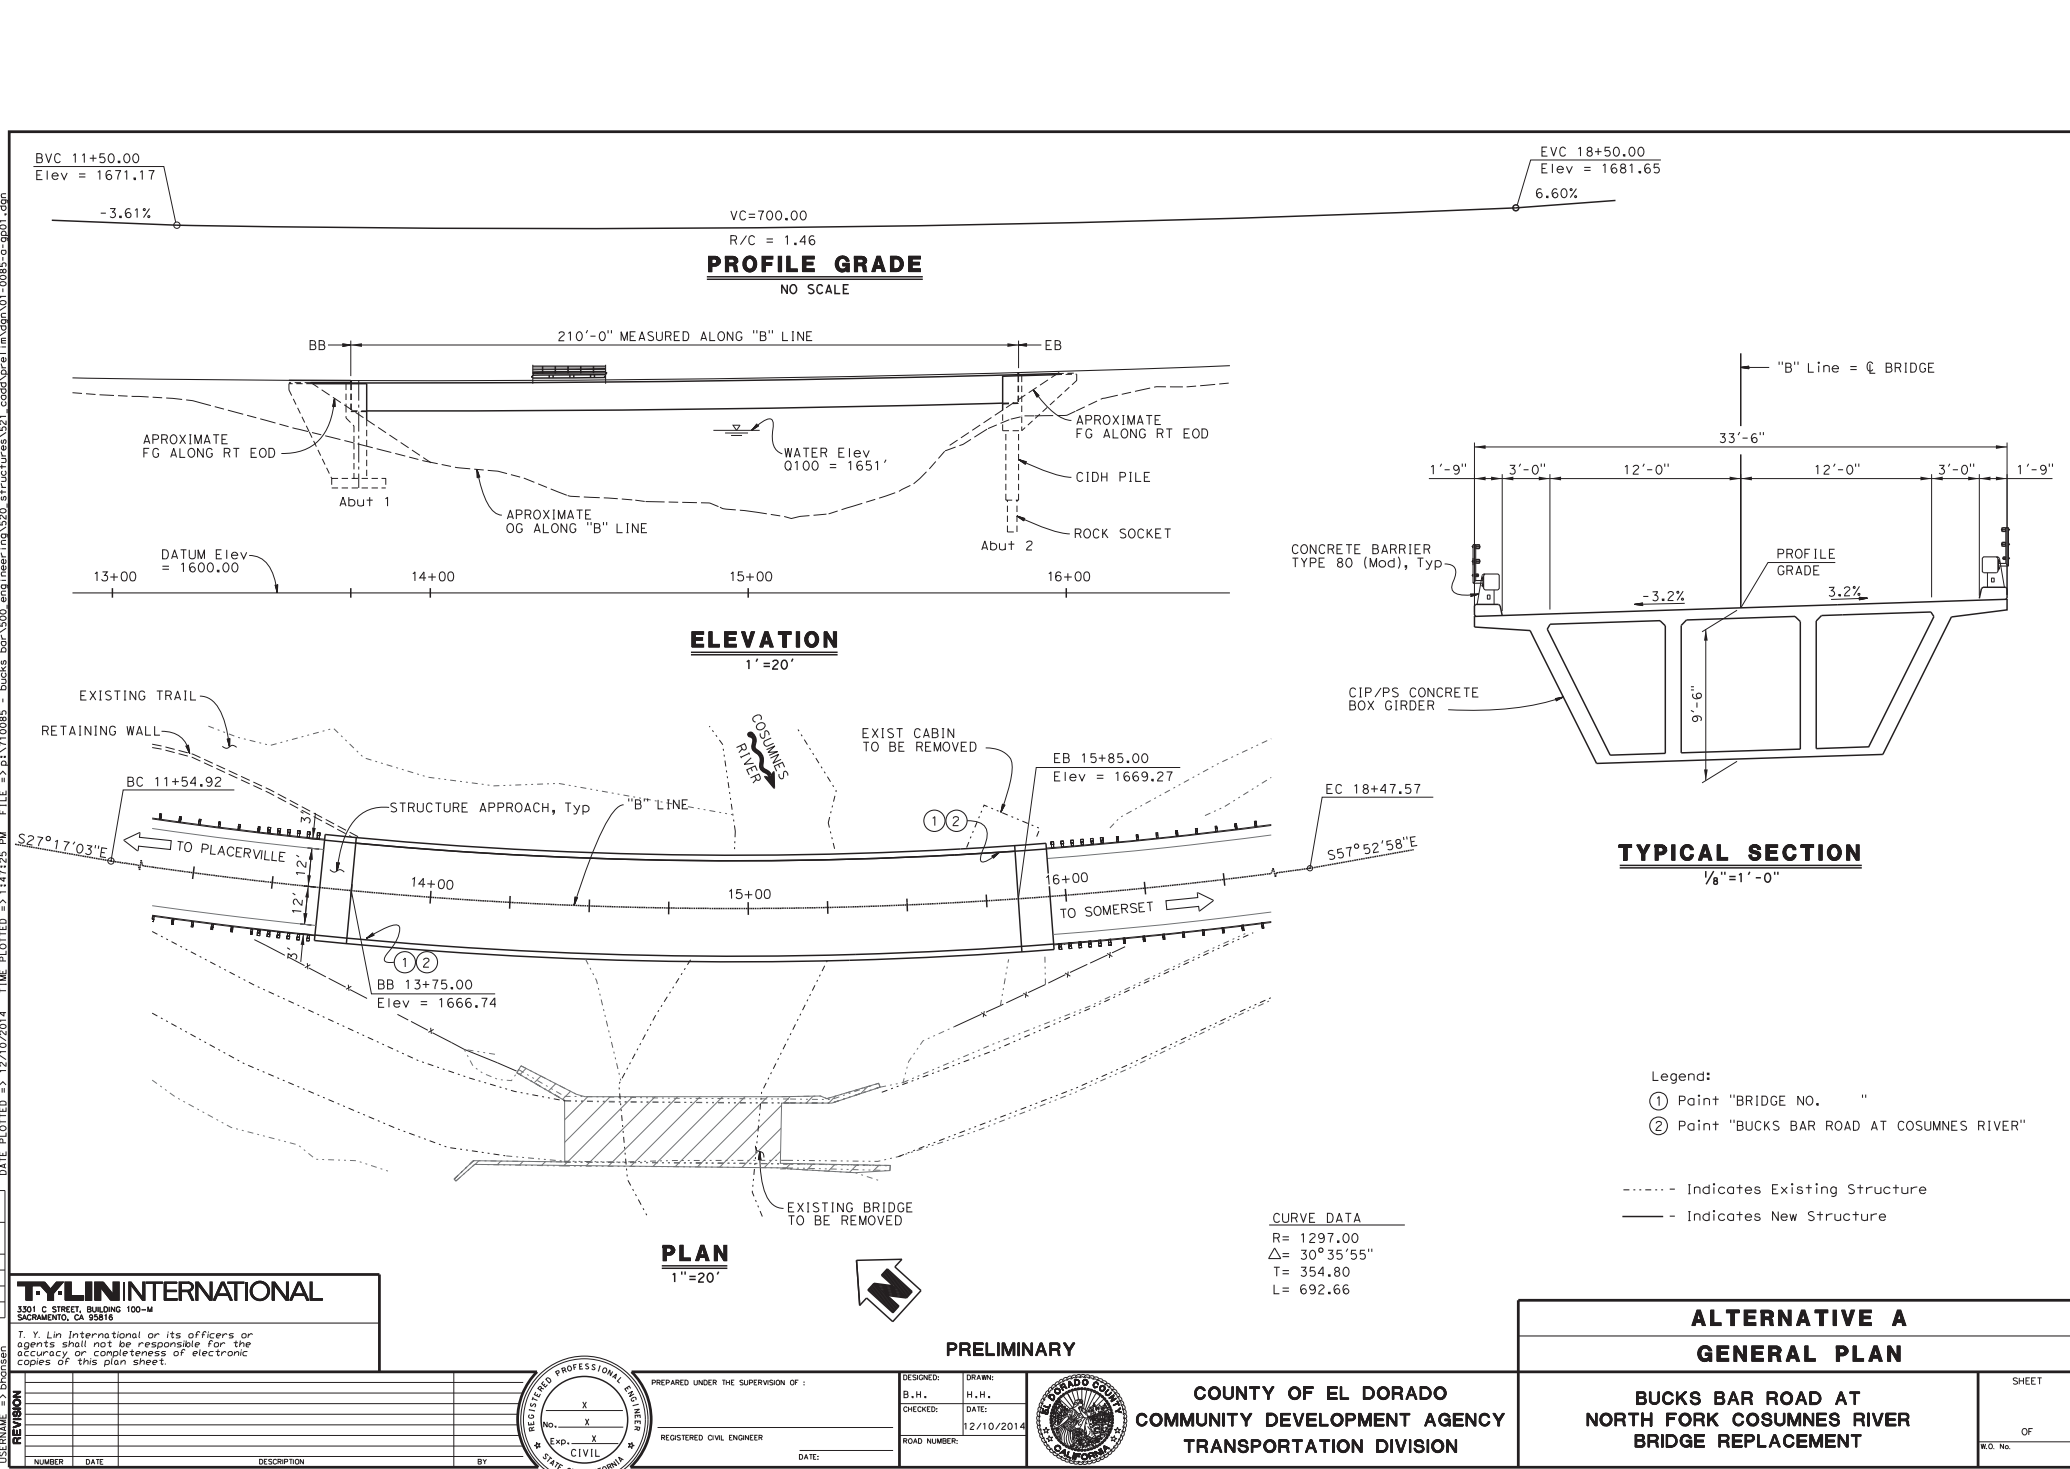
Proposed Bridge Plan and Profile Views (Alternative A)
